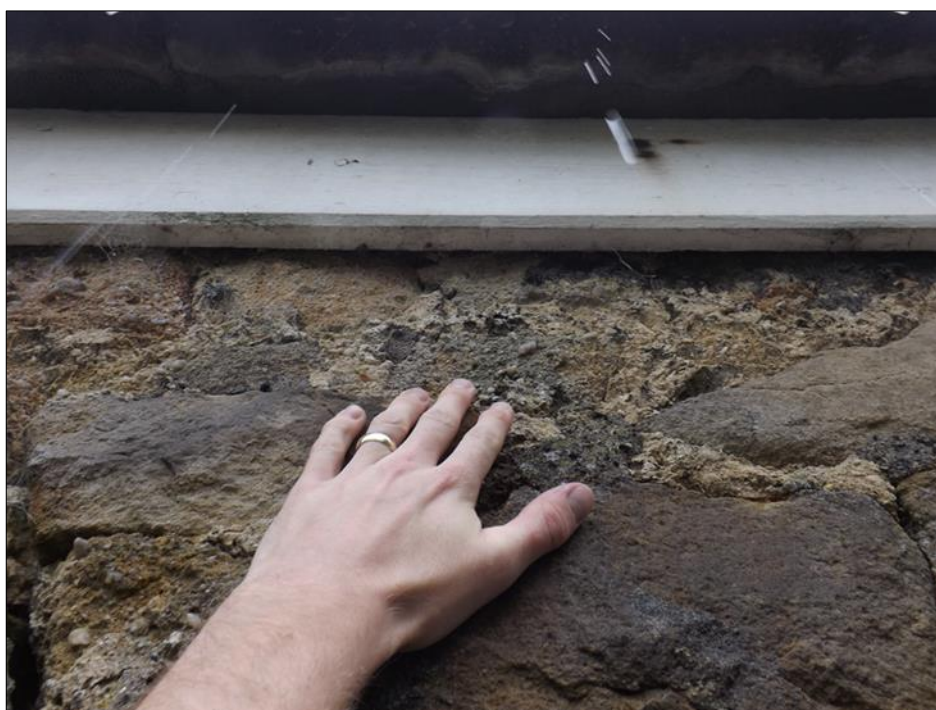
The soffit board on the roof line showed bat access and roosting potential
